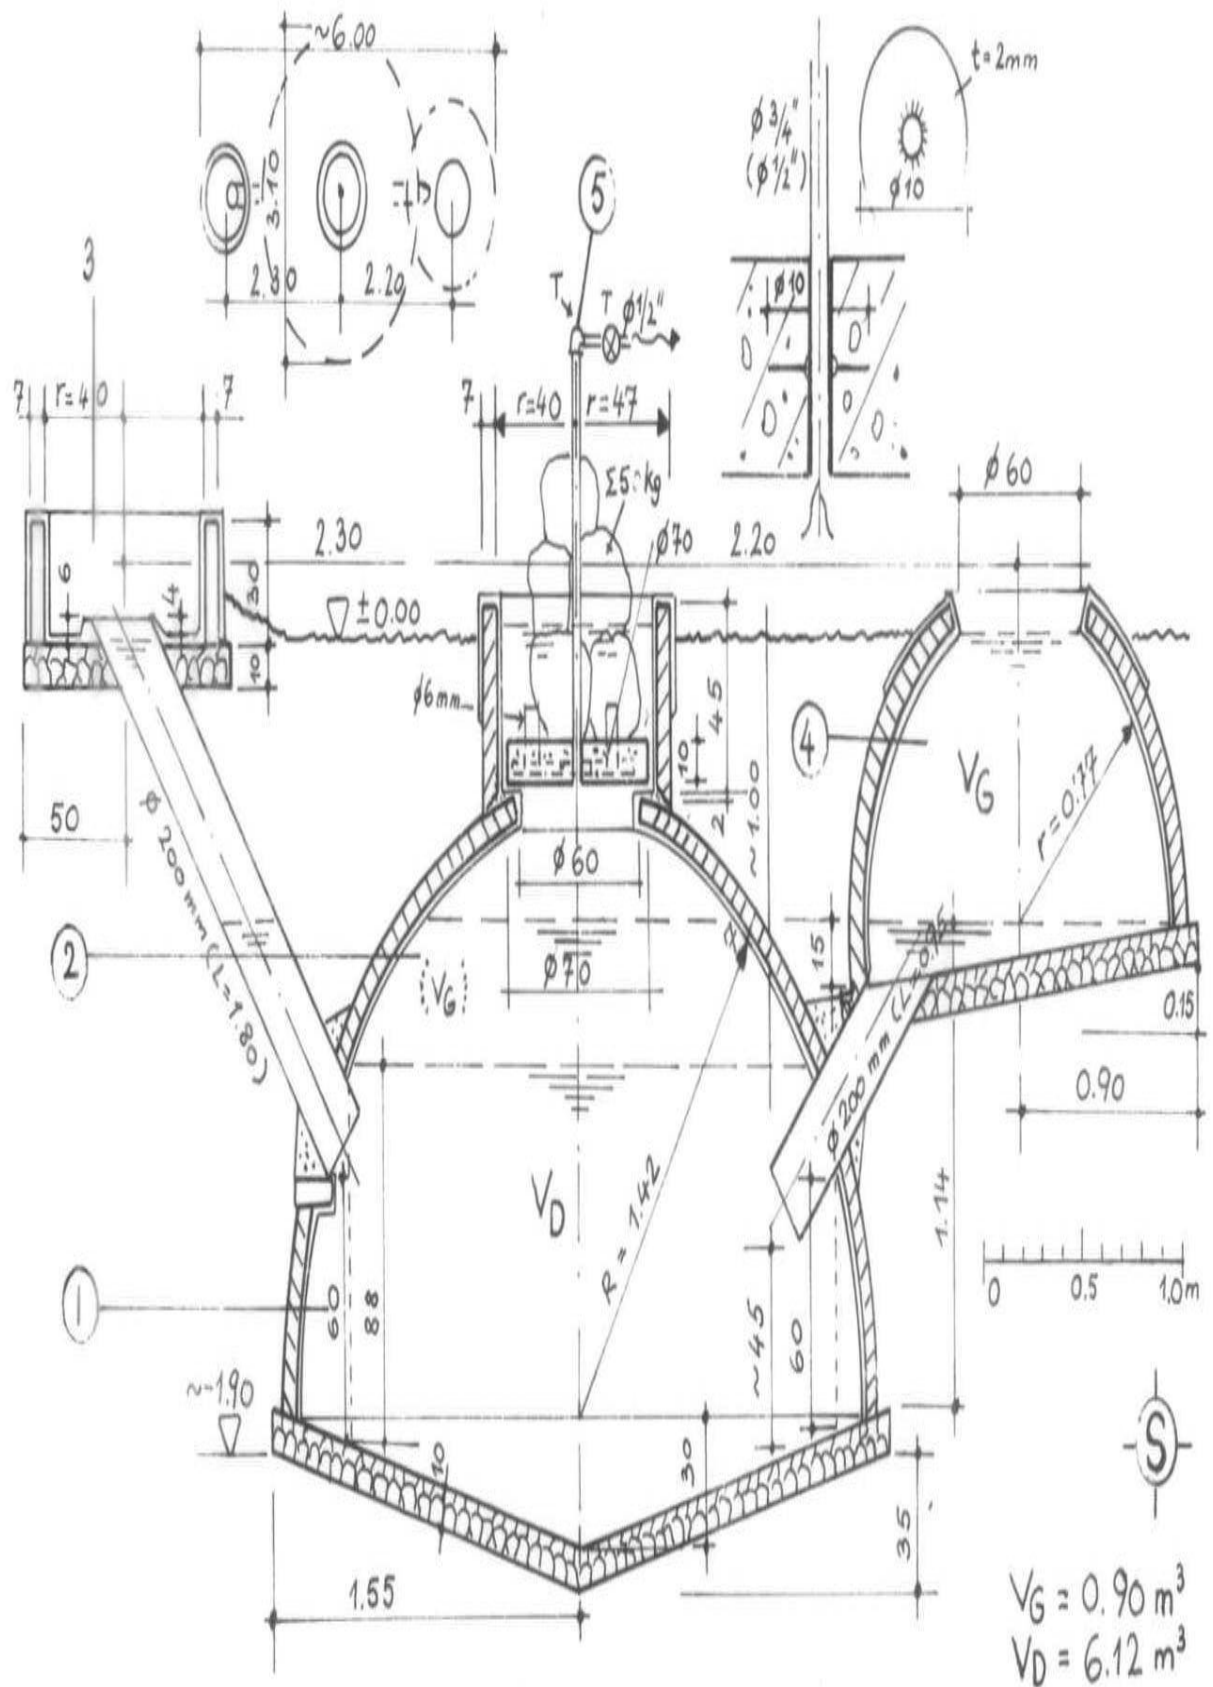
Dome biogas plant (5, 93) _ 1. Digester pit 2. Gas holder 3. Inlet tank 4. Outlet tank 5. Gas outlet tube.
